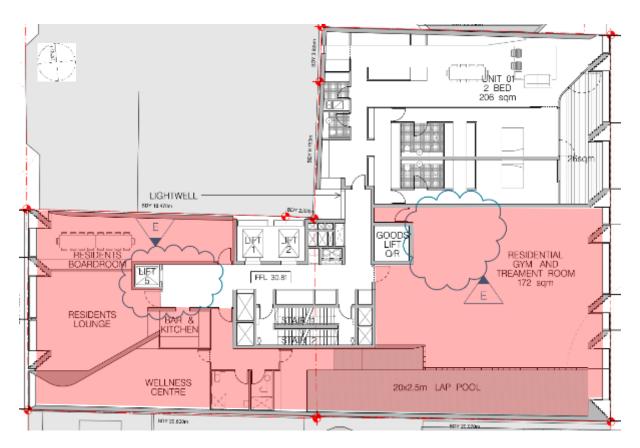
Level 1 Floor Plan, communal areas shaded in red
